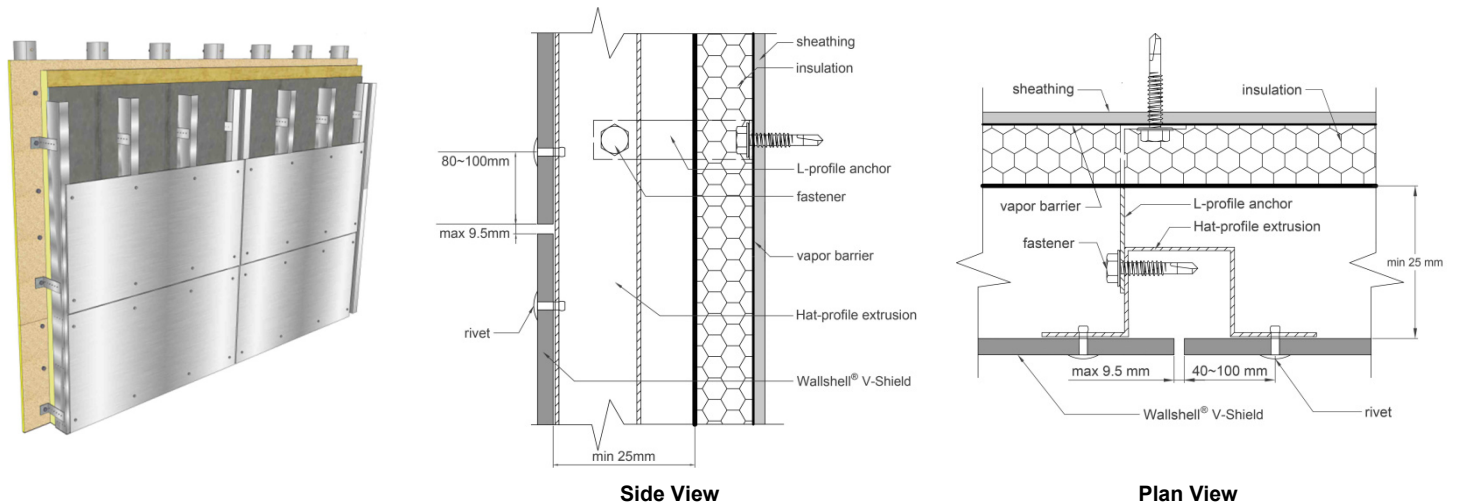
ILLUSTRATION OF A WALPANEL WALLSHELL V-SHIELD PANEL CLADDING SYSTEM SUPPORTED BY A VISIBLE ATTACHMENT SYSTEM
